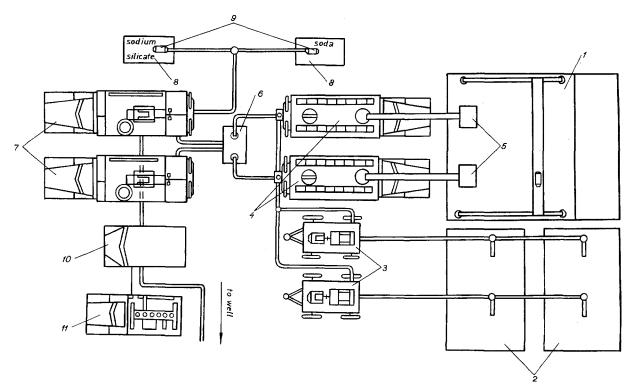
Multi-purpose arrangement of equipment for grout mixing and injection. I = clay slurry preparation plant; $2 = 250 \text{ m}^3 \text{ slurry holding tanks}$; 3 = transfer pumps; 4 = cement-mixing truck; 5 = hoppers; $6 = 1 \text{ m}^3 \text{ tank}$; 7 = grout pump truck; $8 = 4 \text{ m}^3 \text{ tanks}$; 9 = pump; 10 = manifold truck; 11 = monitoring truck.
